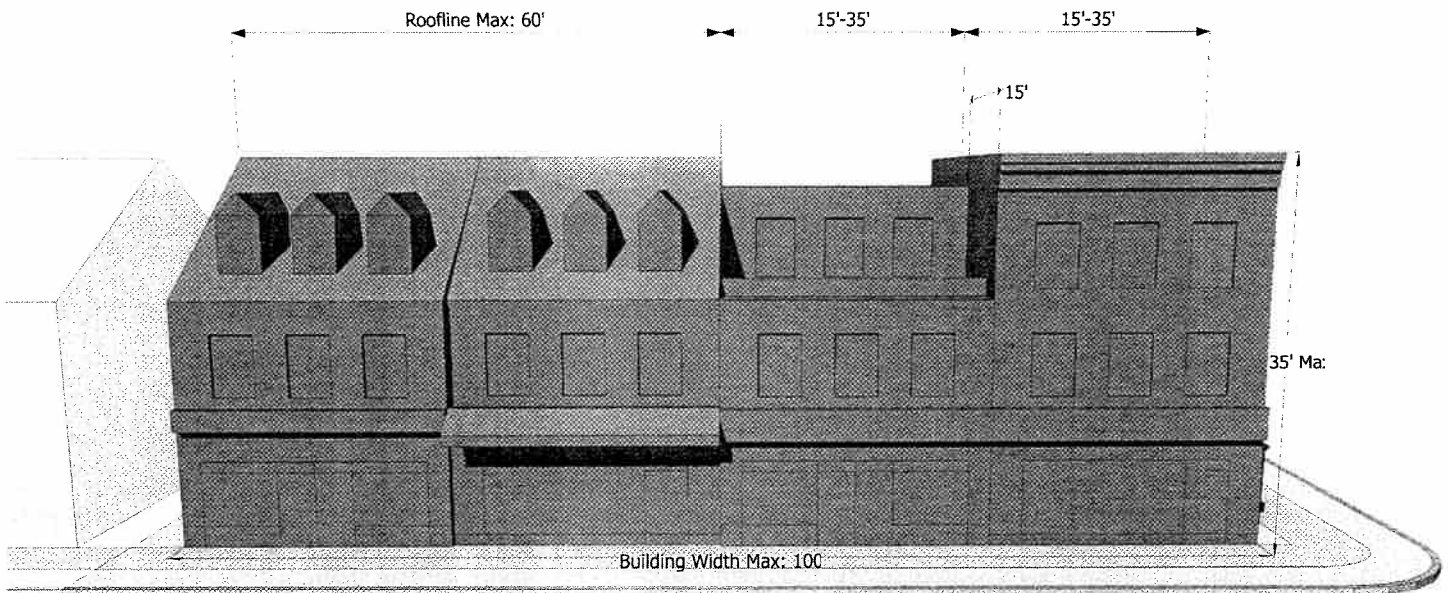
A - General Urban Design Standards For All New Construction In Downtown Districts and Gateway Districts
